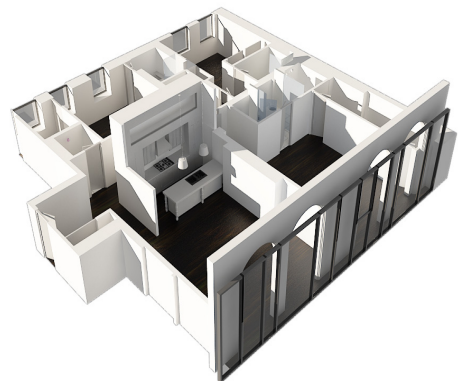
Lower Floor Unit with the 17ft tall cast-iron arches (1st – 5th floors)
